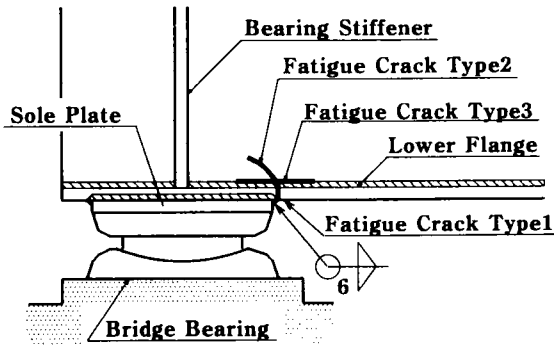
Fatigue cracks near bridge bearings.
